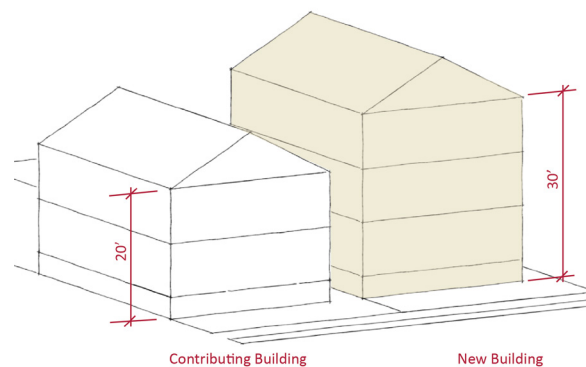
The height of new buildings should be no more than 150% of the height of surrounding contributing buildings.
